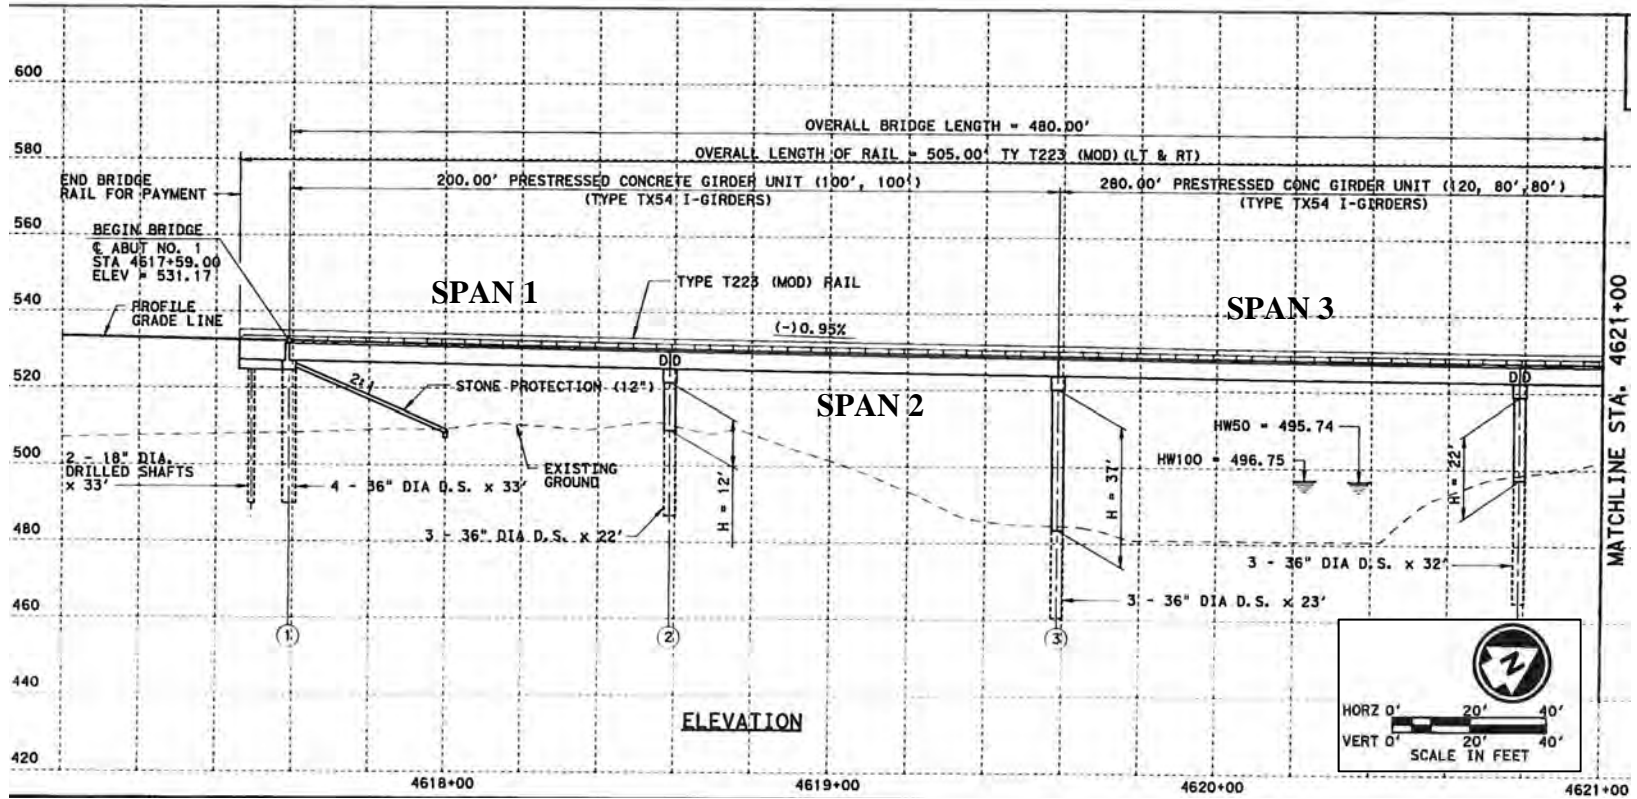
Section view of Lampasas River Bridge (Spans 1 to 3)
